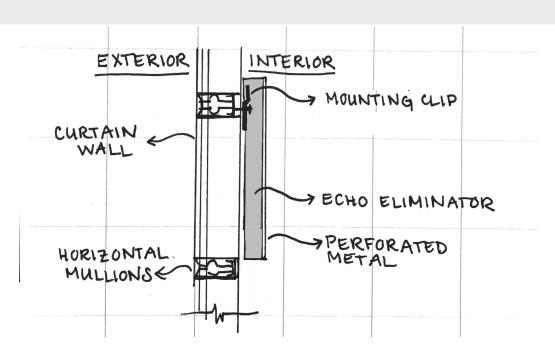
Section Detail | Daylighting + Acoustical Panel Curtainwall Mounting
